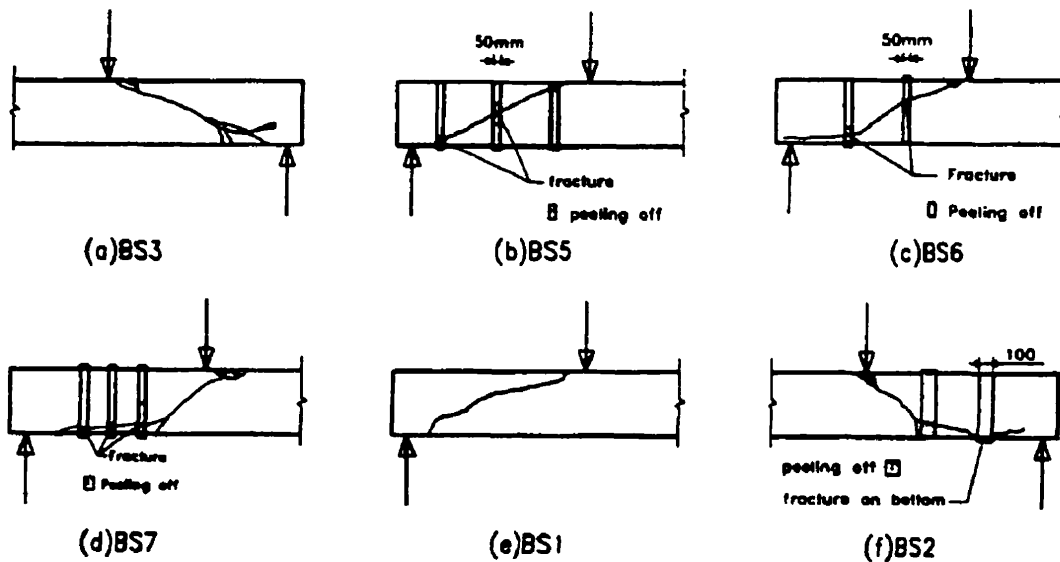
Failure modes of shear-strengthened beams tested by Taerwe *et al.* [27]
